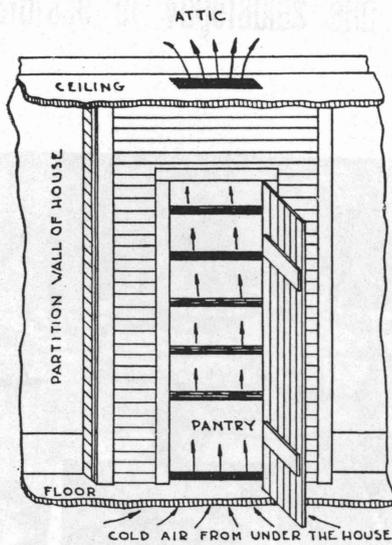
Ventilated pantry. Plans for construction shown on blueprint No. 208.
